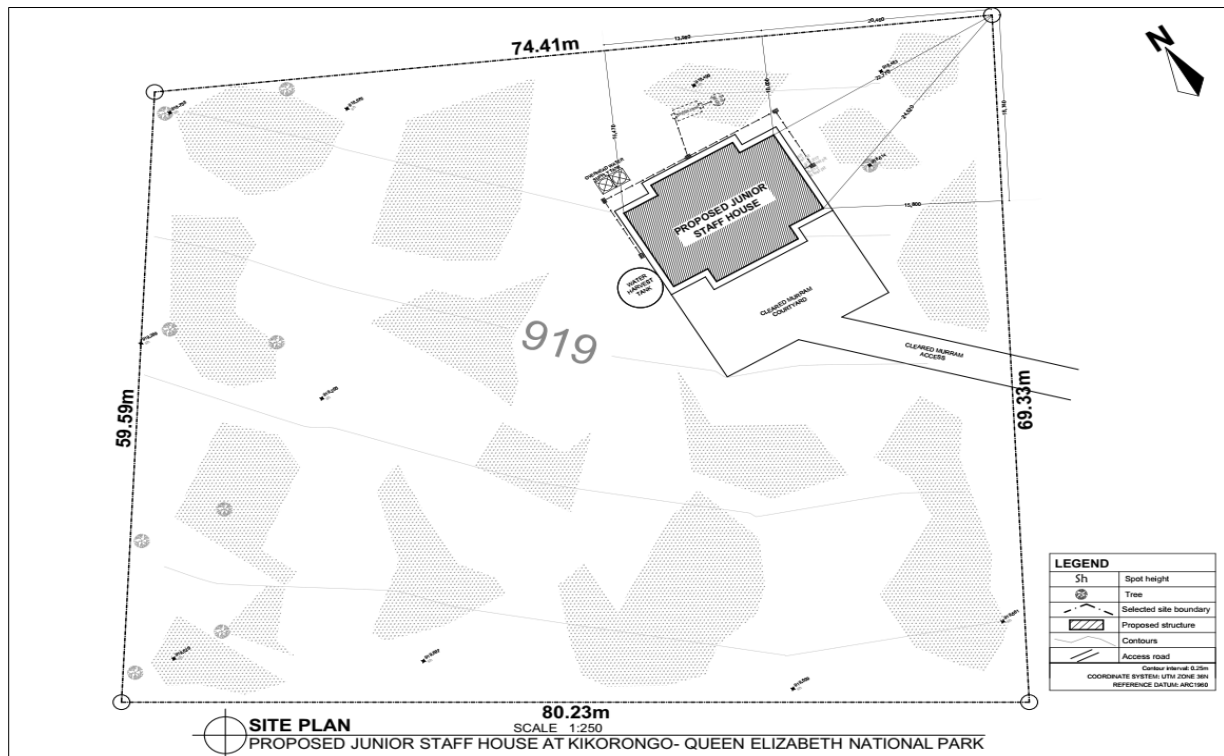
Kikorongo Junior Staff Accommodation Site Plan
